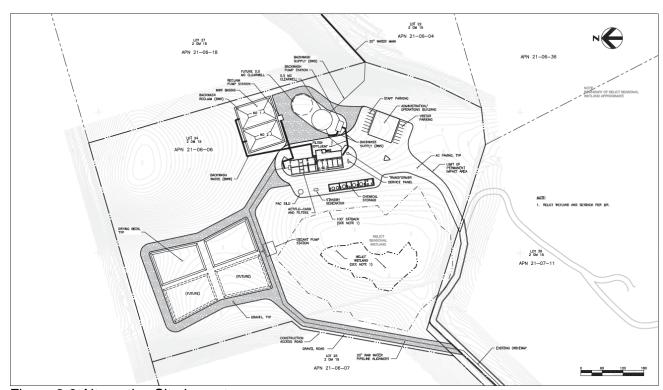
Alternative Site Layout (San Benito County Water District 2014)
